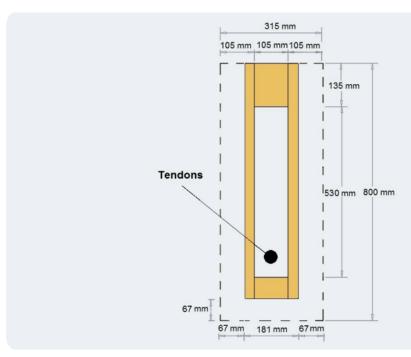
Residual cross-section of a simply-supported post-tensioned beam.
